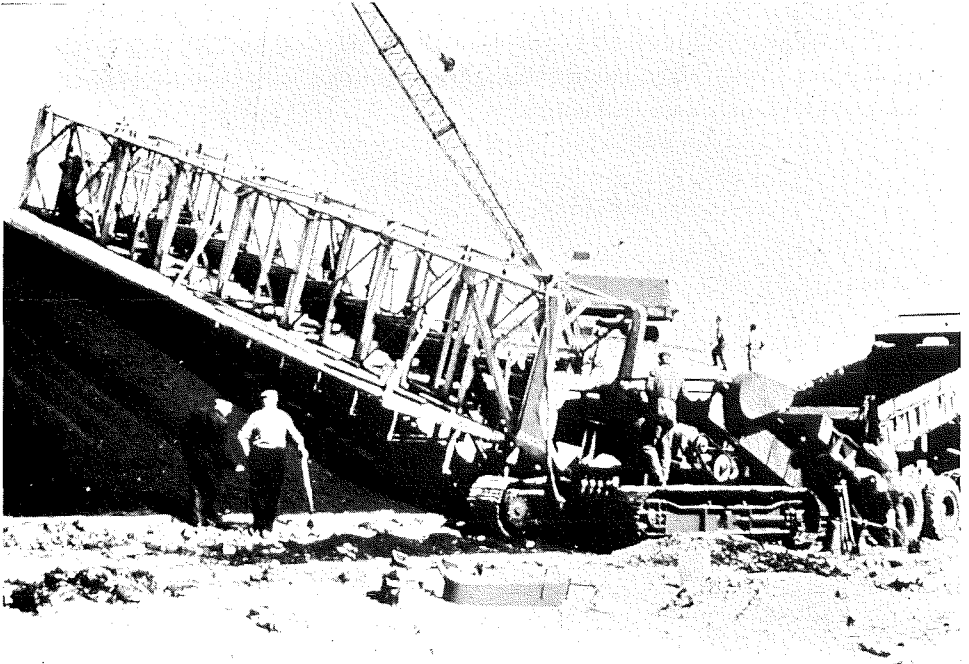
Placing of an asphaltic concrete revetment using a finisher specially constructed for use on a slope
